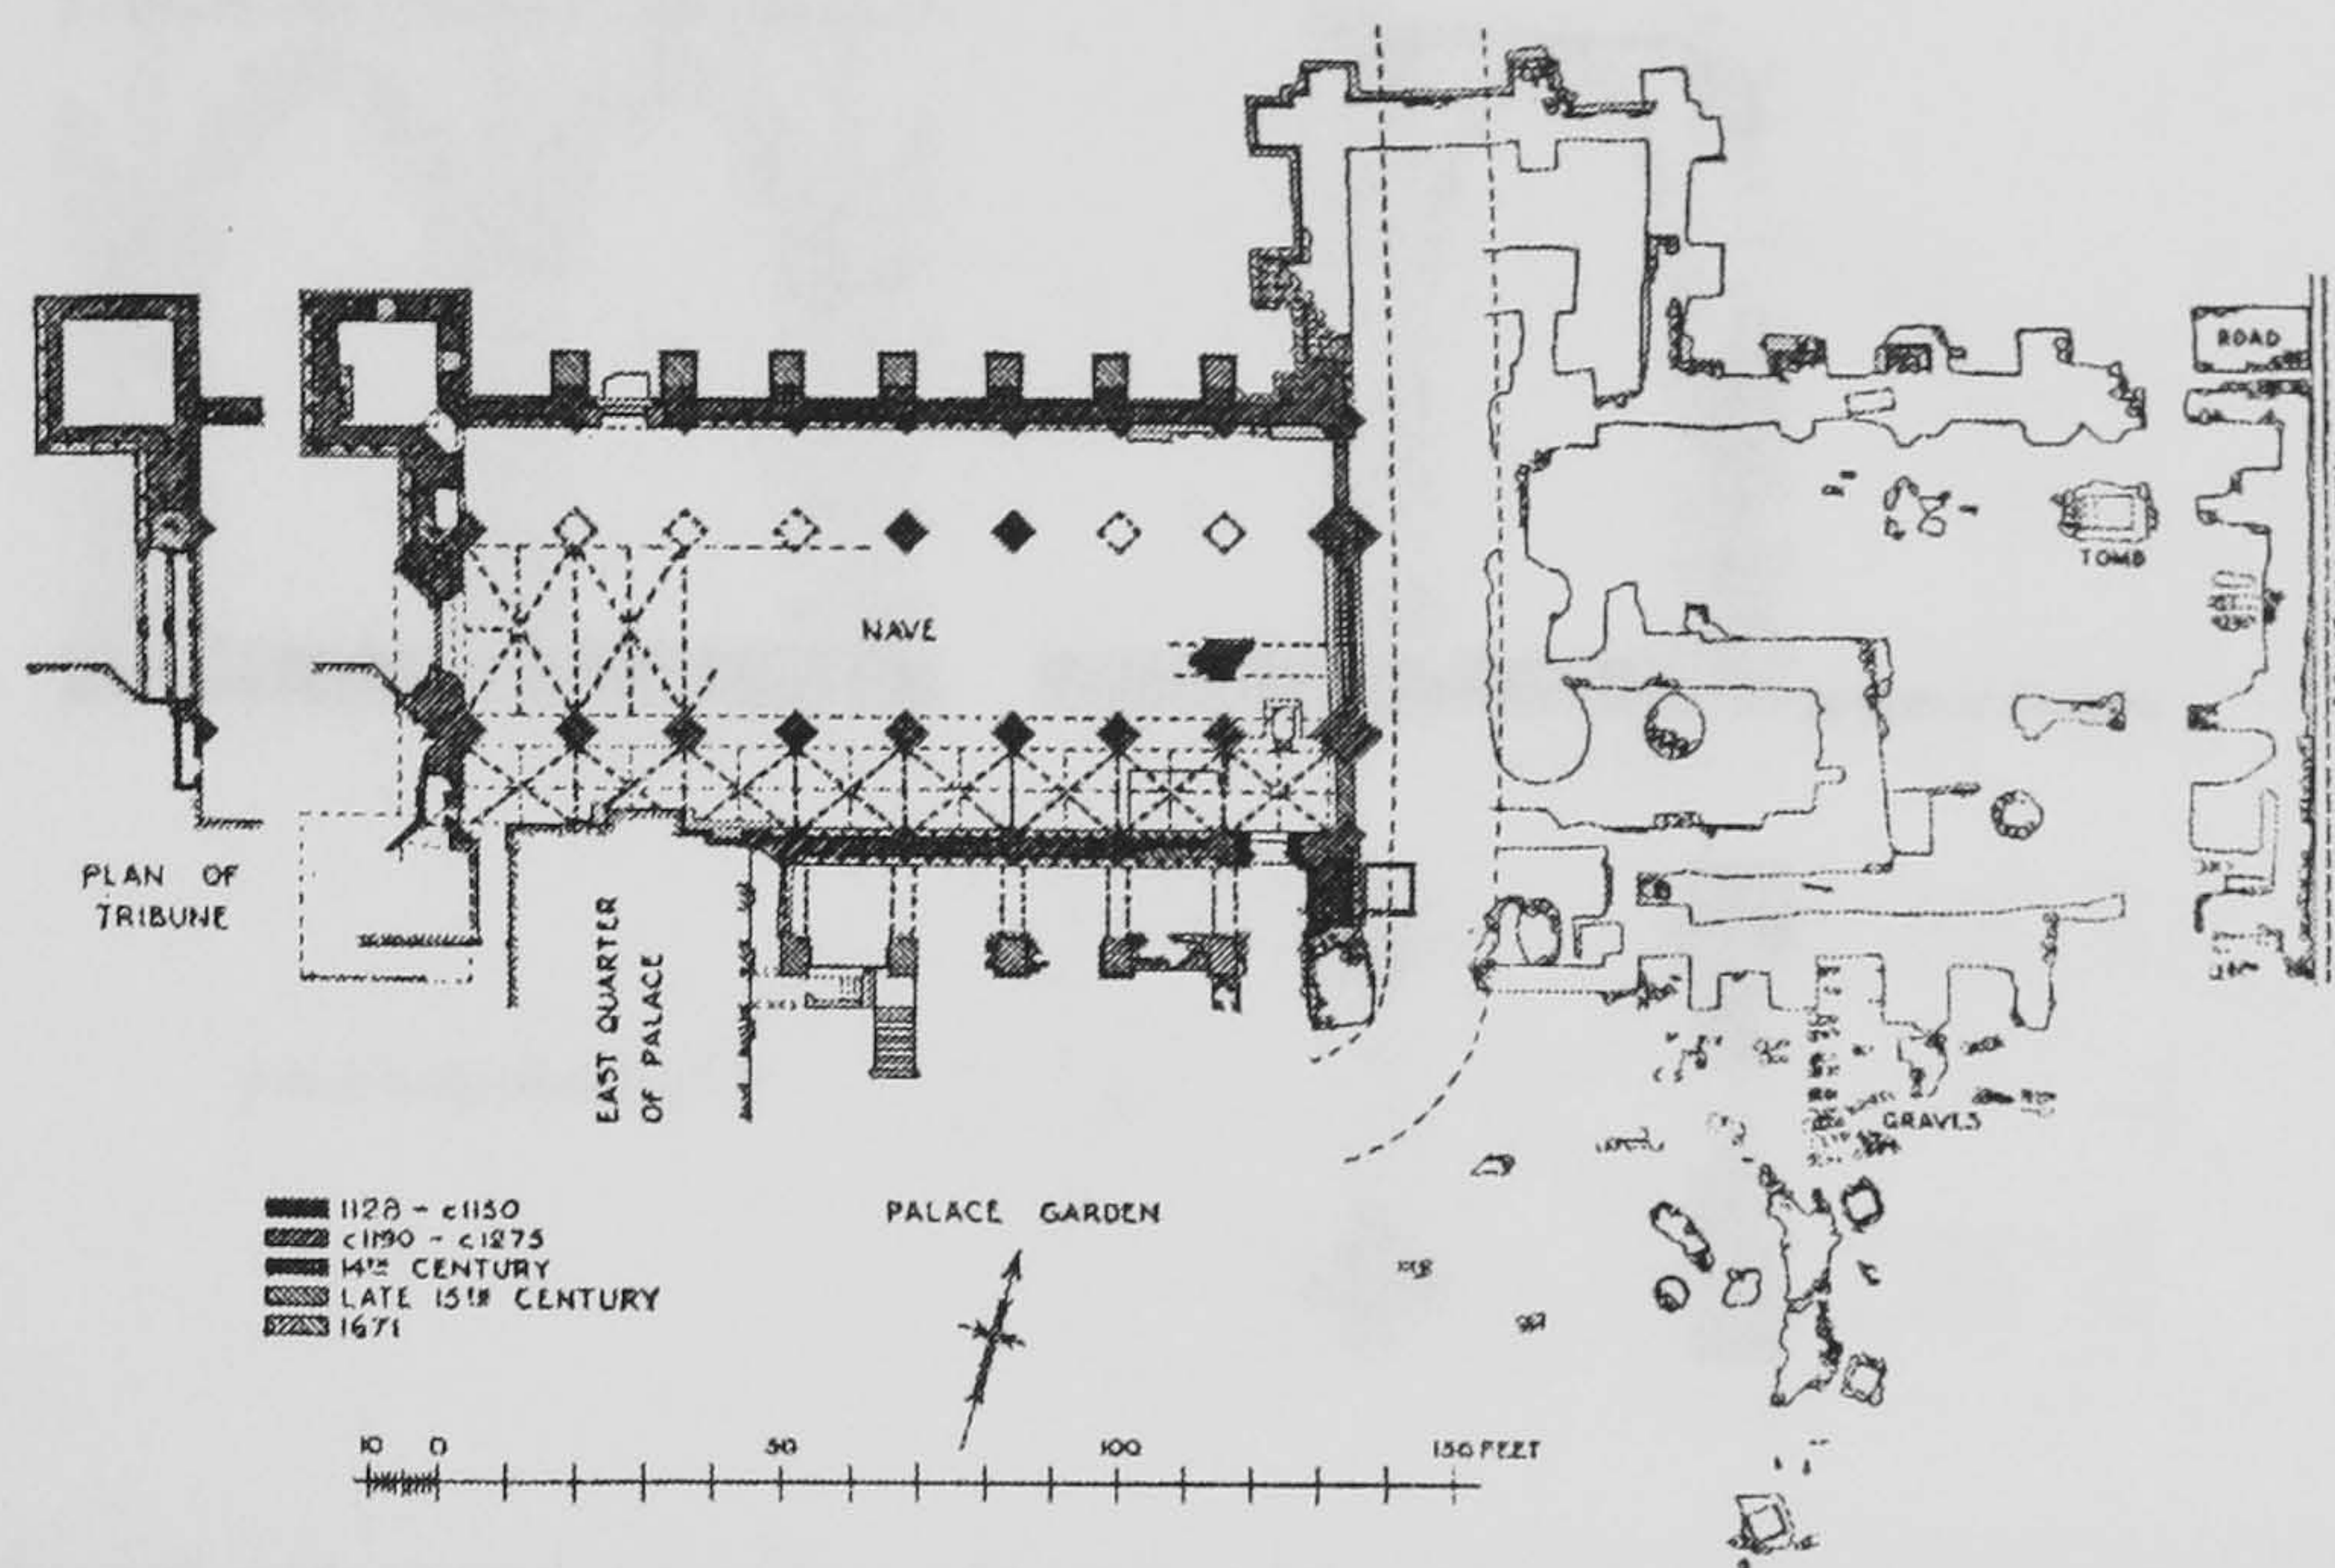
Plan of the Abbey Church of Holyrood. Major building campaigns and actual state (Oldrieve 1911)
